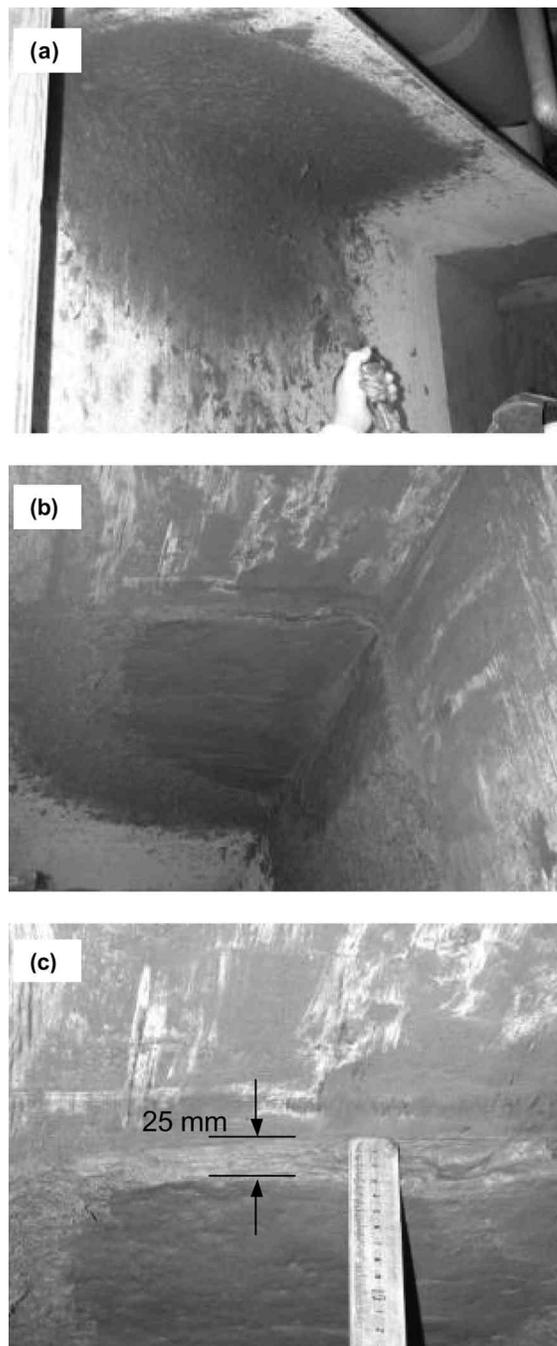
Spray-on test to overhead surface (Mixture S-3) for: (a) spraying ECC onto overhead surface; (b) sprayed layer of ECC; and (c) 25 mm thickness of sprayed ECC layer.
